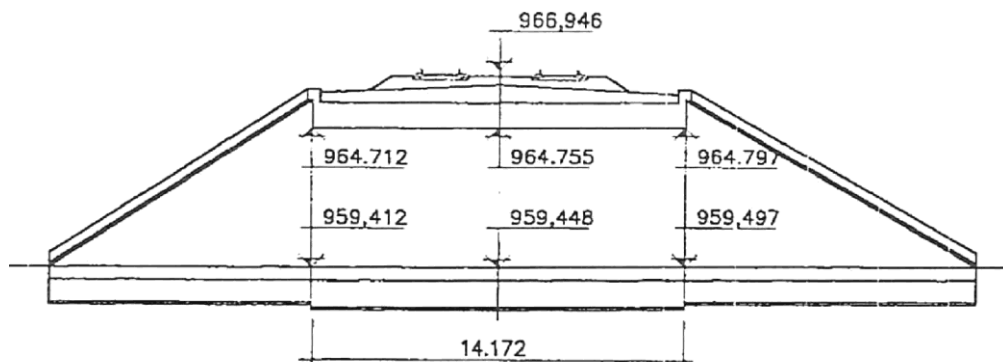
Bridge PI024, cross-section A-A across the bridge.
